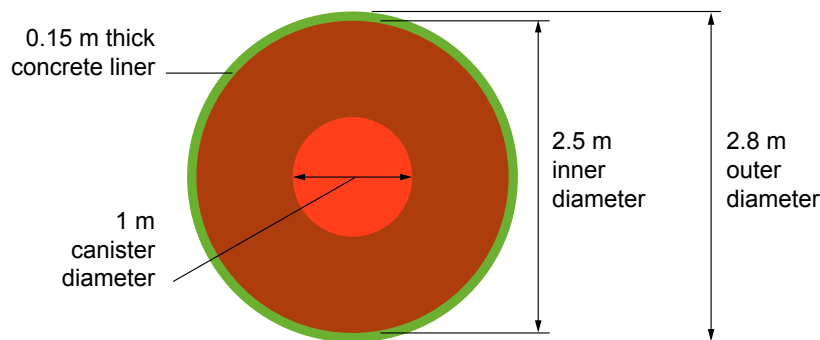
Dimensions of the outer and inner tunnel sections and canister (not to scale).
